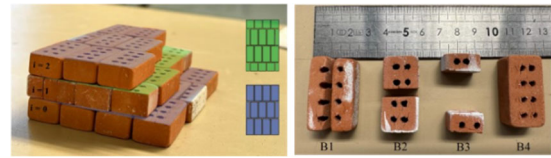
Bonding pattern of the experimental reduced-scale wall with crossed joints in two spatial directions, leaving the bed joints open. Fired clay bricks. B1: corner bricks, B2: half bricks, B3: quarter bricks, B4: full brick
